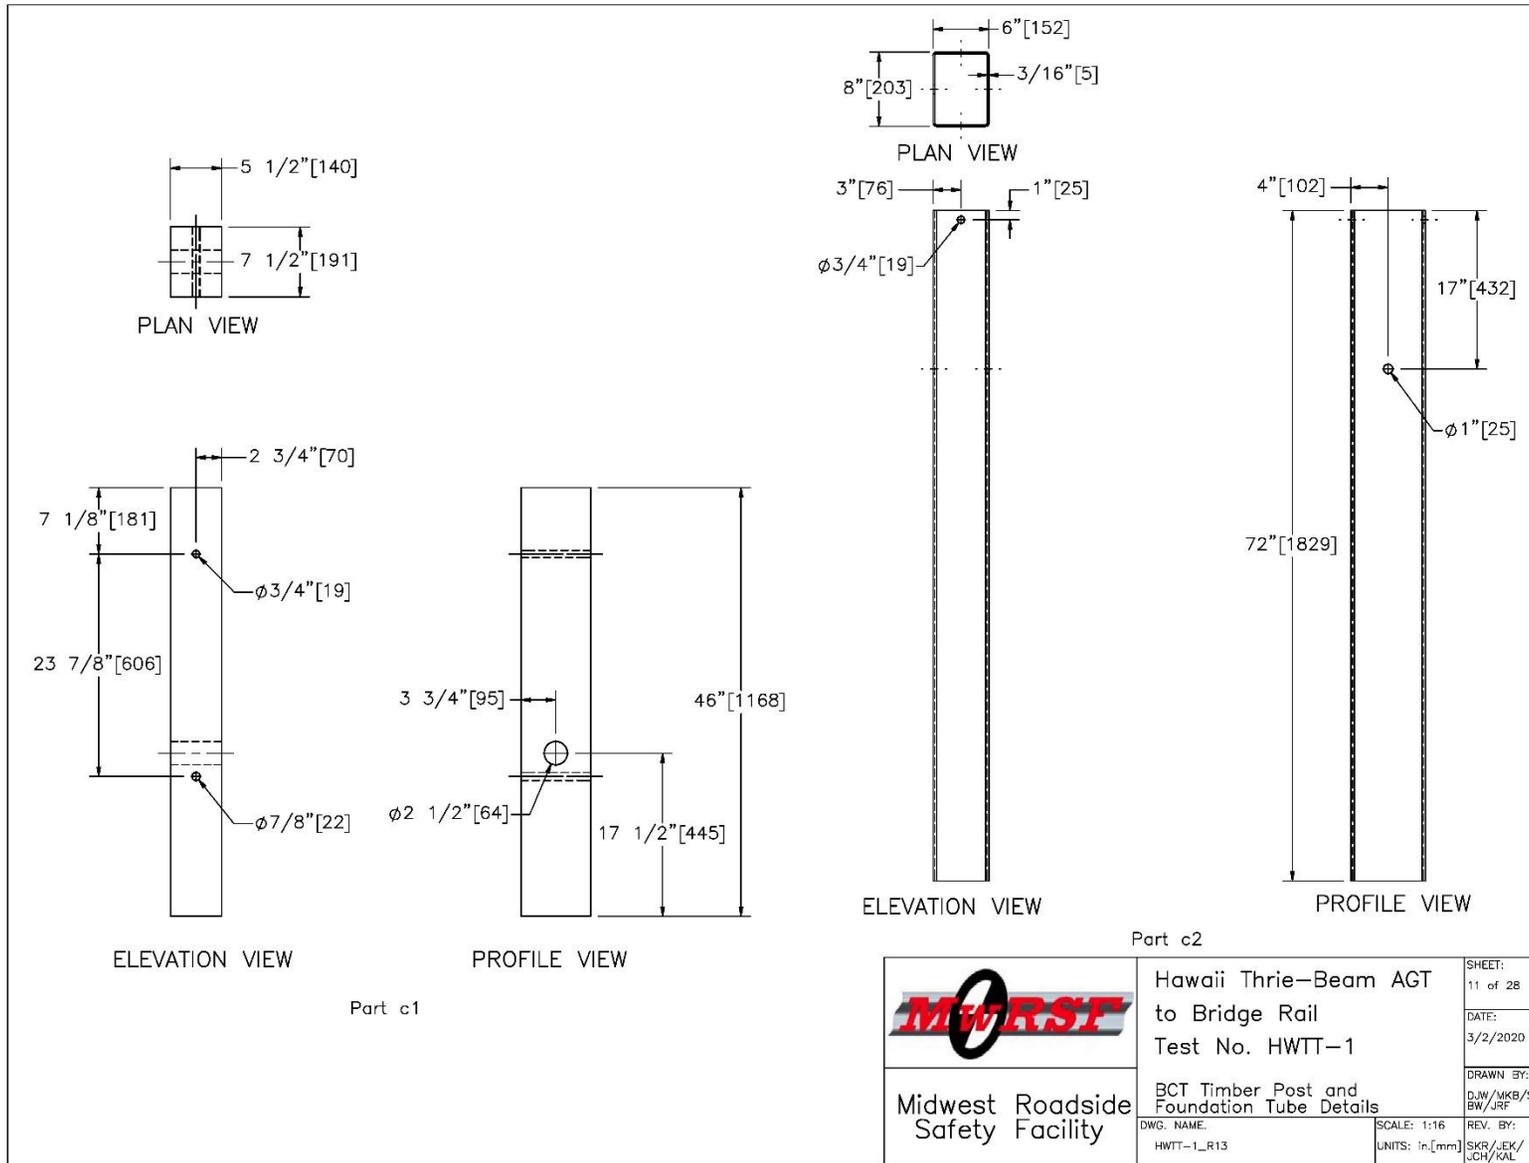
BCT Timber Post and Foundation Tube Details, Test Nos. HWTT-1 and HWTT-2
